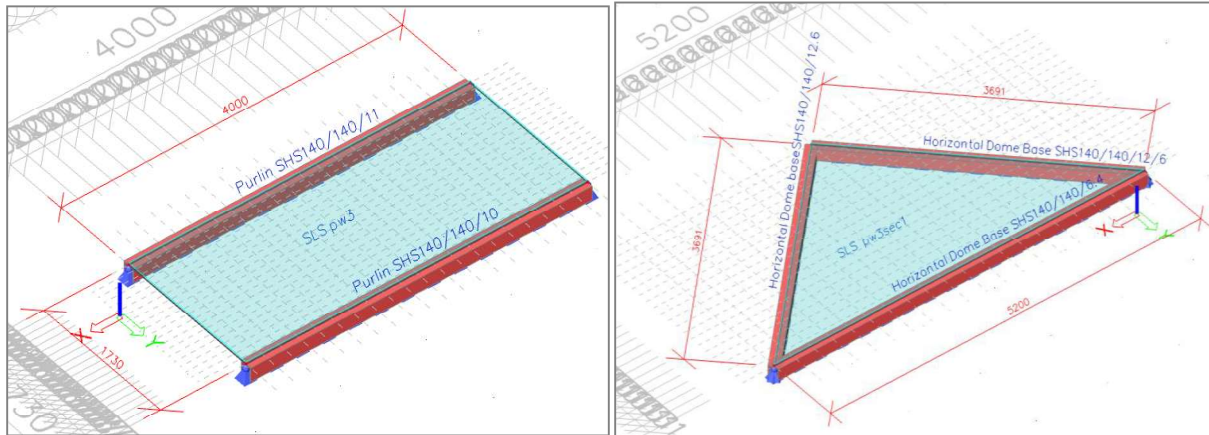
3-D Finite Element Model of a Triplex Laminated Roof glazing system
